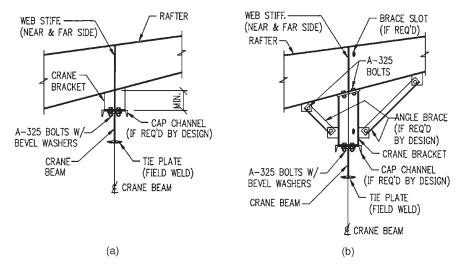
Monorail supports with rigid suspension: (*a*) minimum-length bracket; (*b*) long bracket. (*Metallic Building Systems.*)
